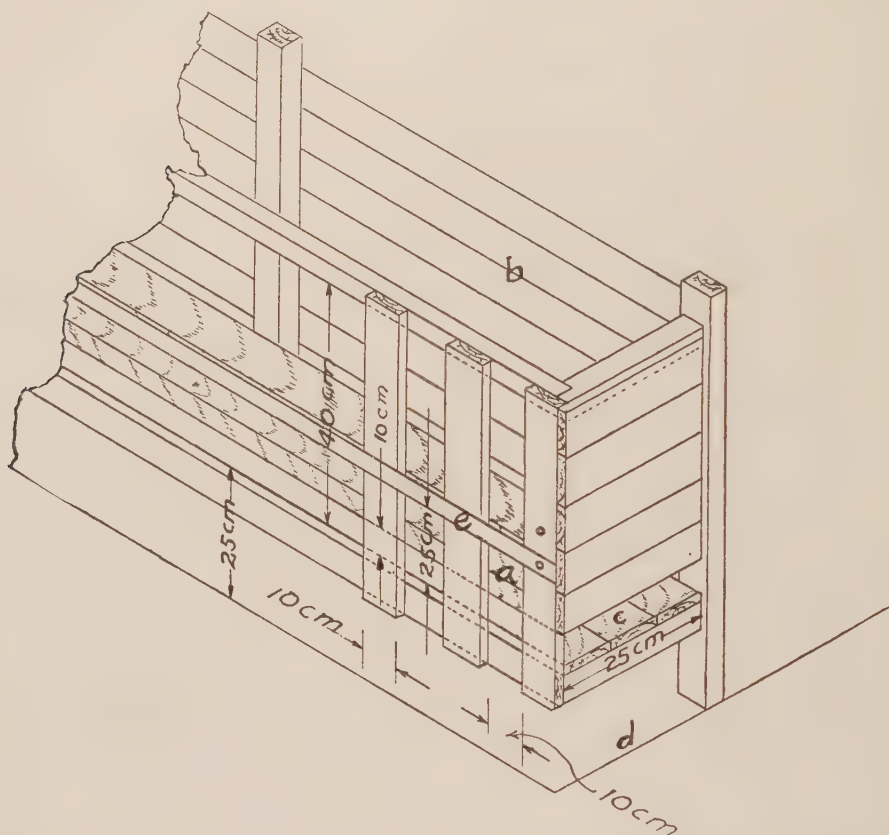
Feeding rack for kids; a. head space; b. wall; c. floor of rack; d. ground floor; e. crosspiece.
